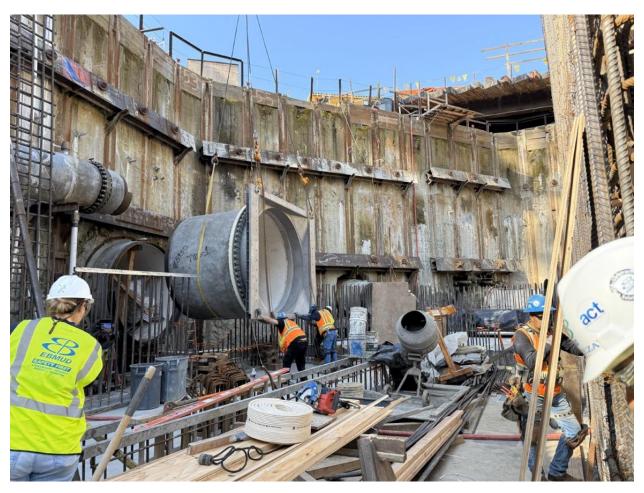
Pipefitters pushing the 108-inch piping and wall gate thimble into place within the UV-CCB Facility with the aid of the tower crane.
